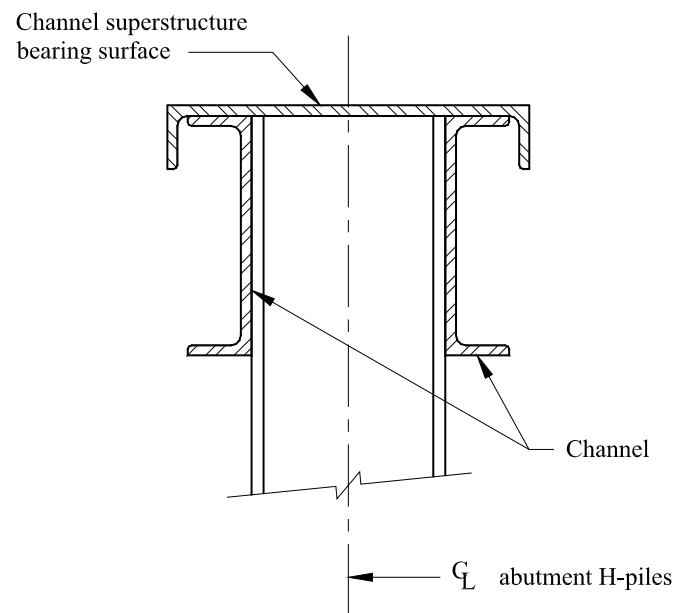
Alternate steel channel pile cap detail for a steel H-pile abutment.
